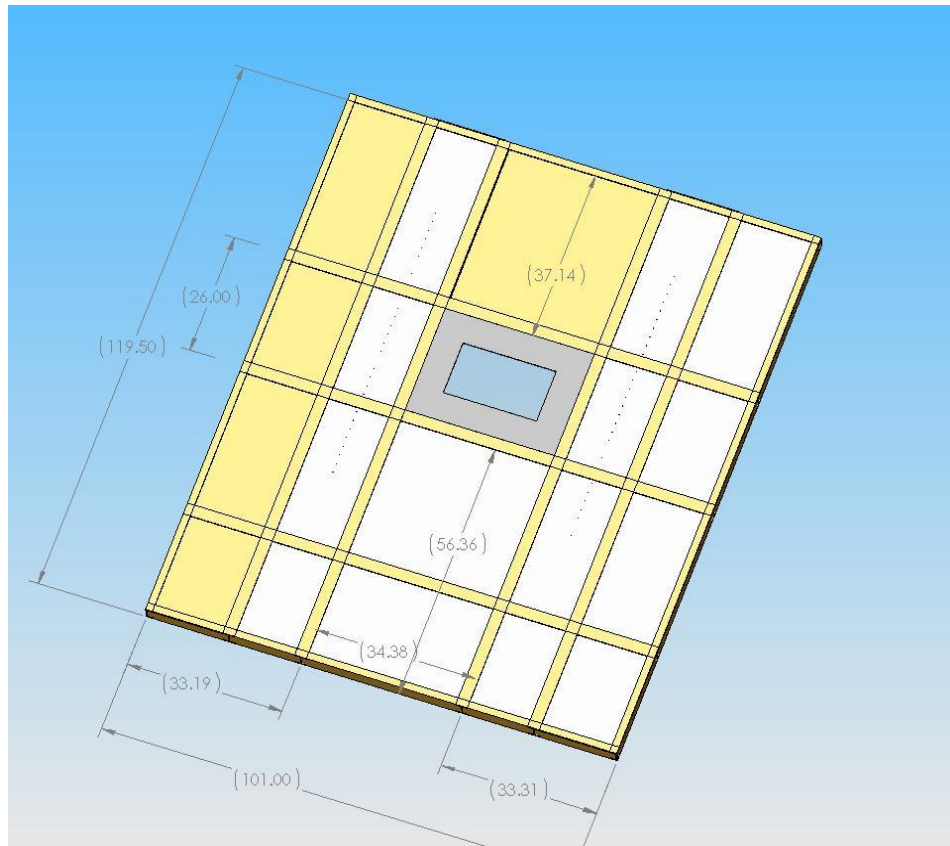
Glass windows, structures to hold wing, vent and door on left wall
